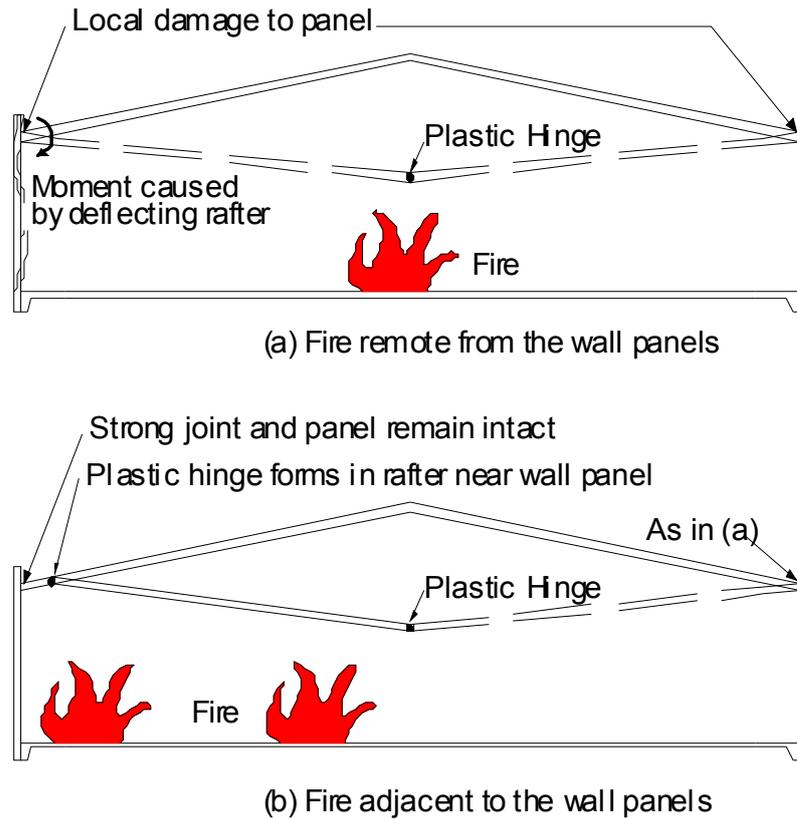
Effects of fire location on the possible behaviour of the rafter-panel connection
